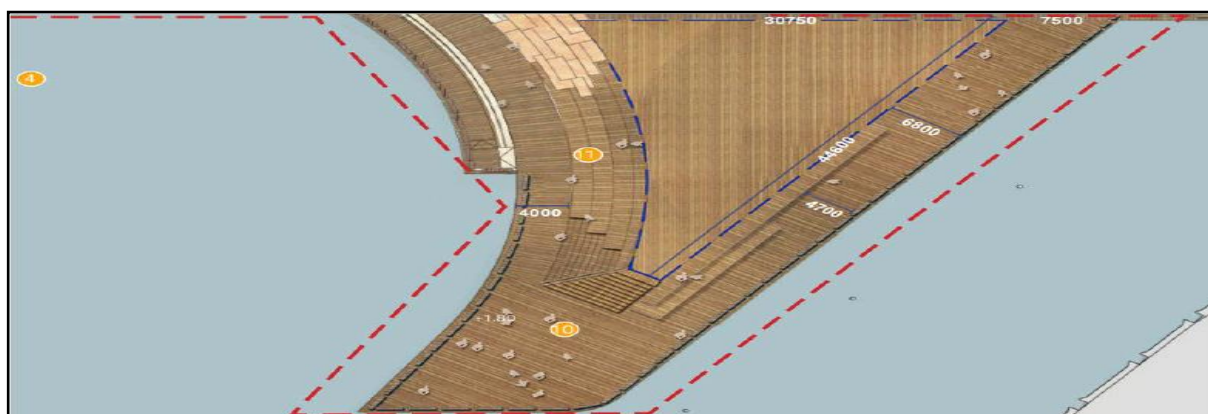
| The approved pier at Watermans Cove (Source: Applicant)
